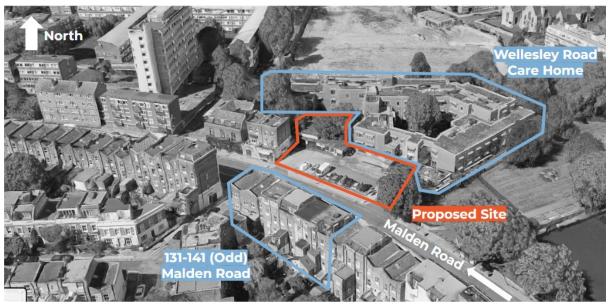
Site plan aerial view with the proposed development (red) and neighbouring buildings assessed (blue)
